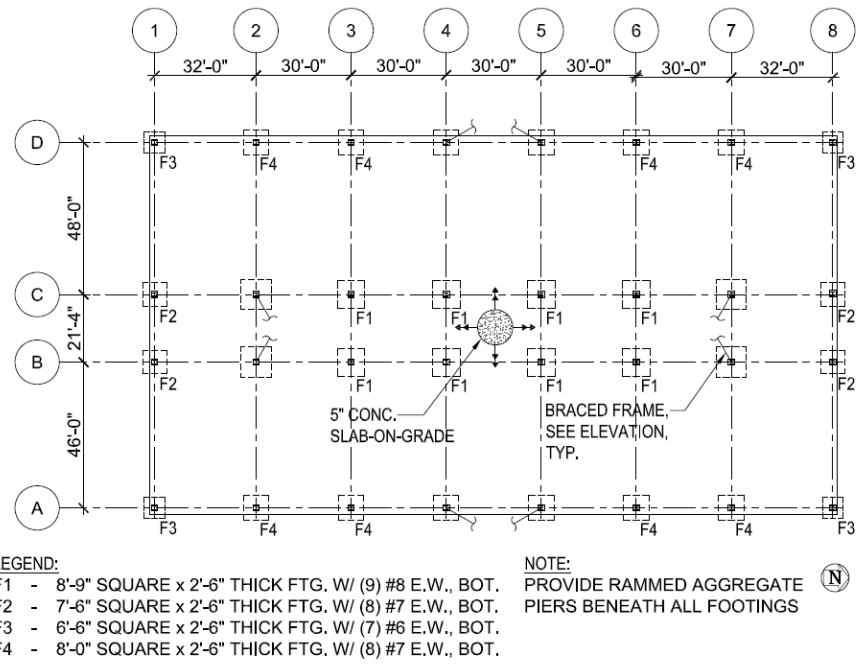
Office building foundation plan showing brace layout for wind design.
